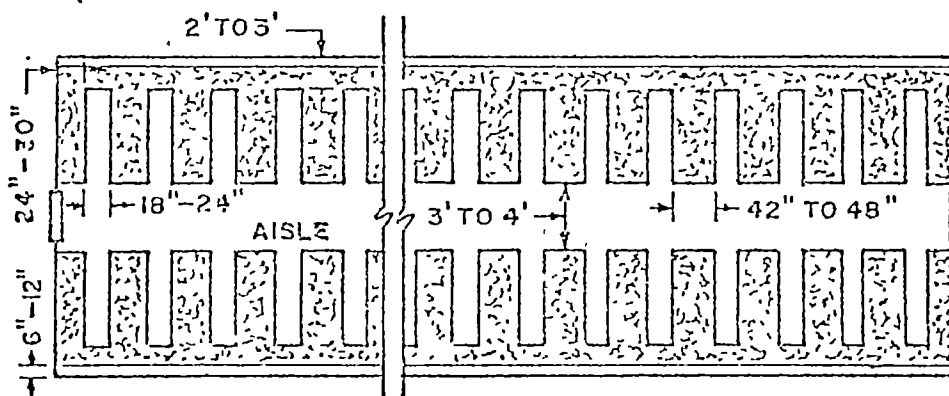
Longitudinal bench arrangement for houses to permit long continuous water lines, heating pipes, and/or plant support techniques.
